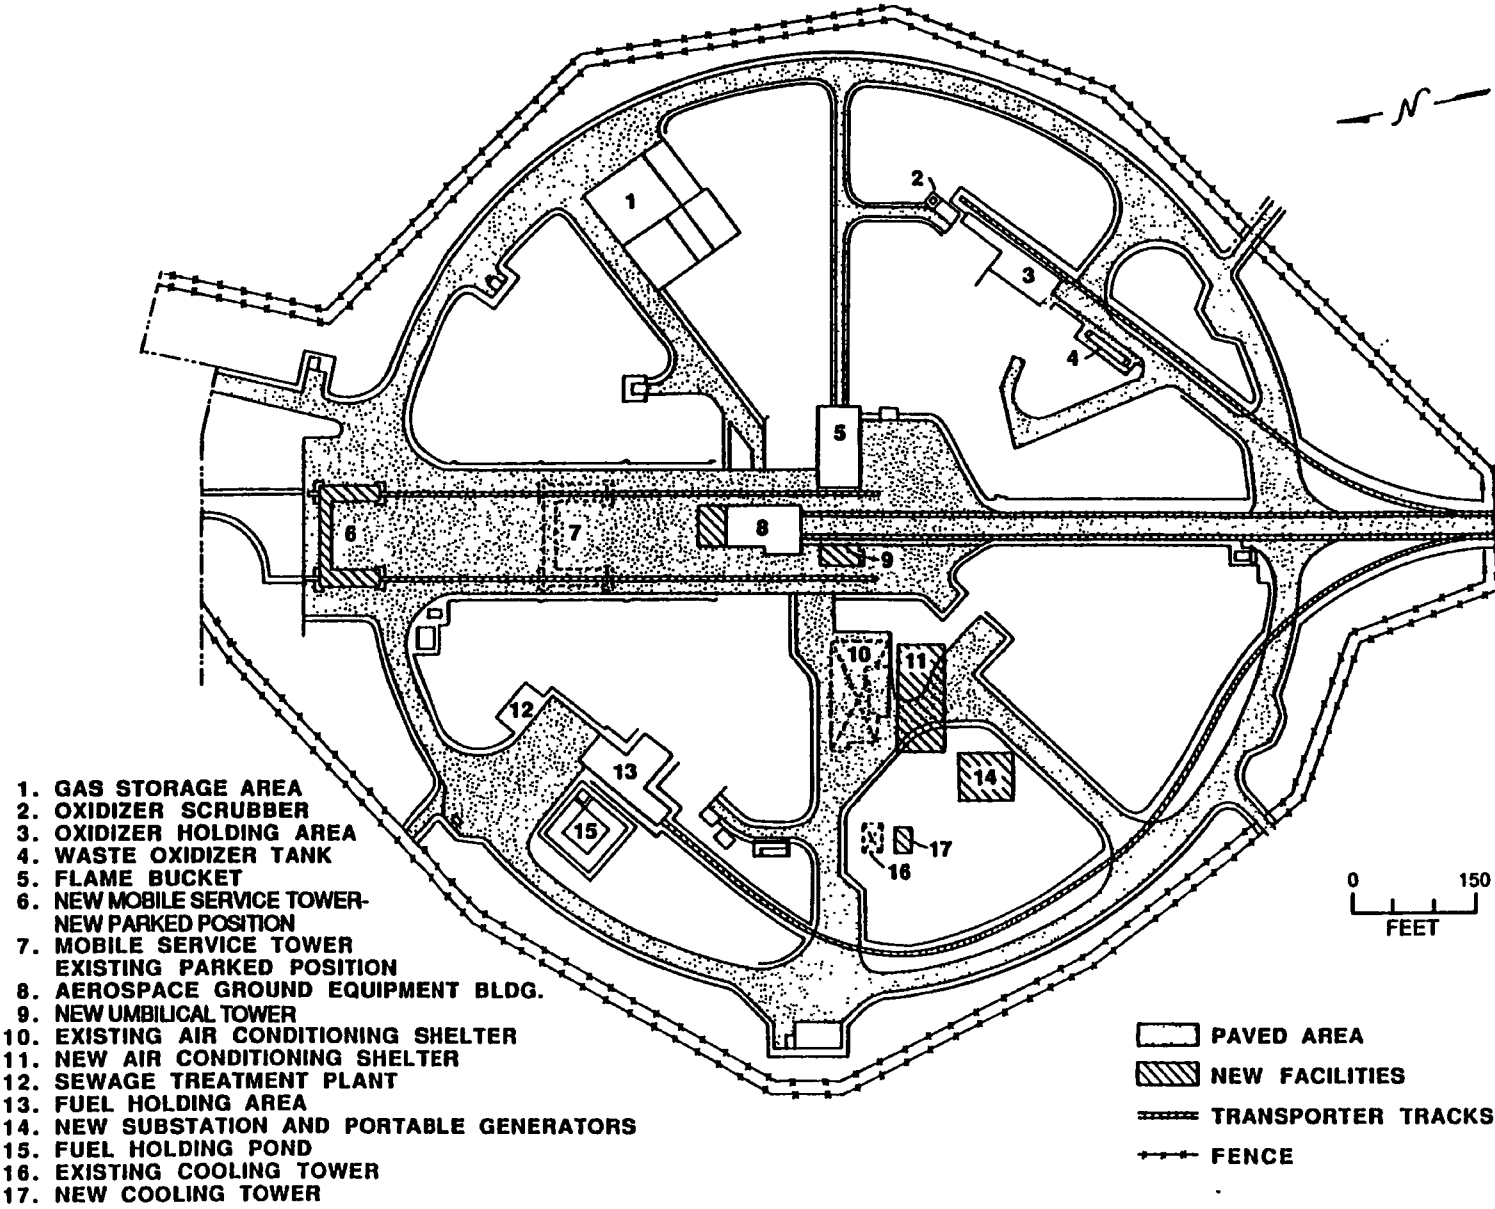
Existing and proposed layout of Launch Complex 40 at Cape Canaveral Air Force Station, Florida.
